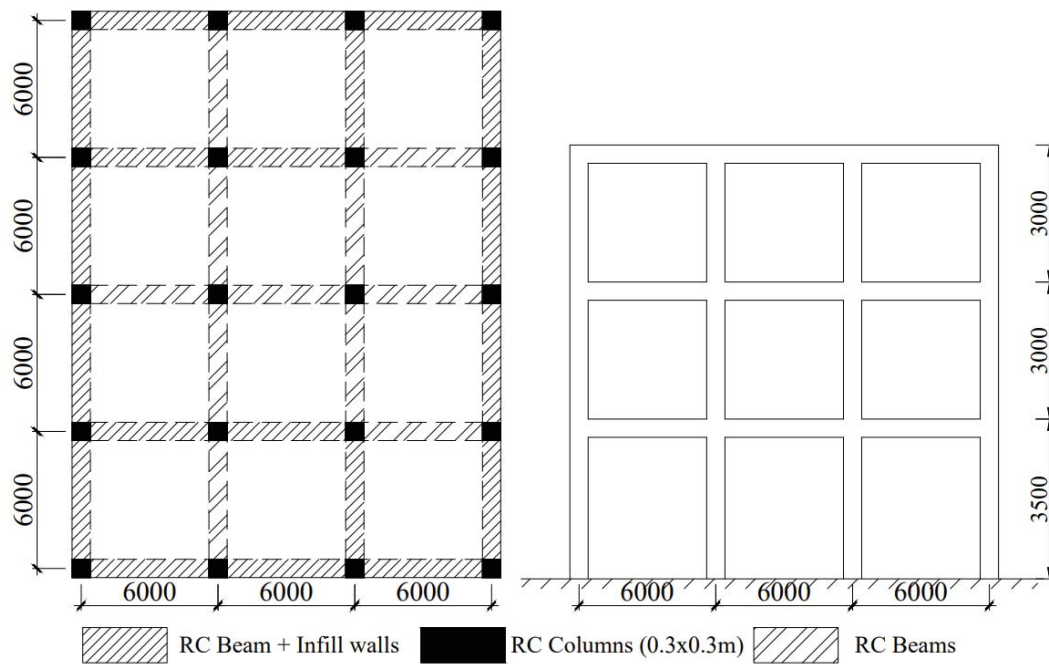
Plan and elevation view of the structural configuration of the case study building.
